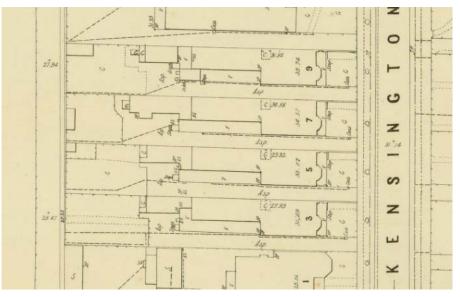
MMBW Detail Plan no. 942, dated 1896, shows the row of four dwellings at 3-9 Kensington Road (source: SLV).
